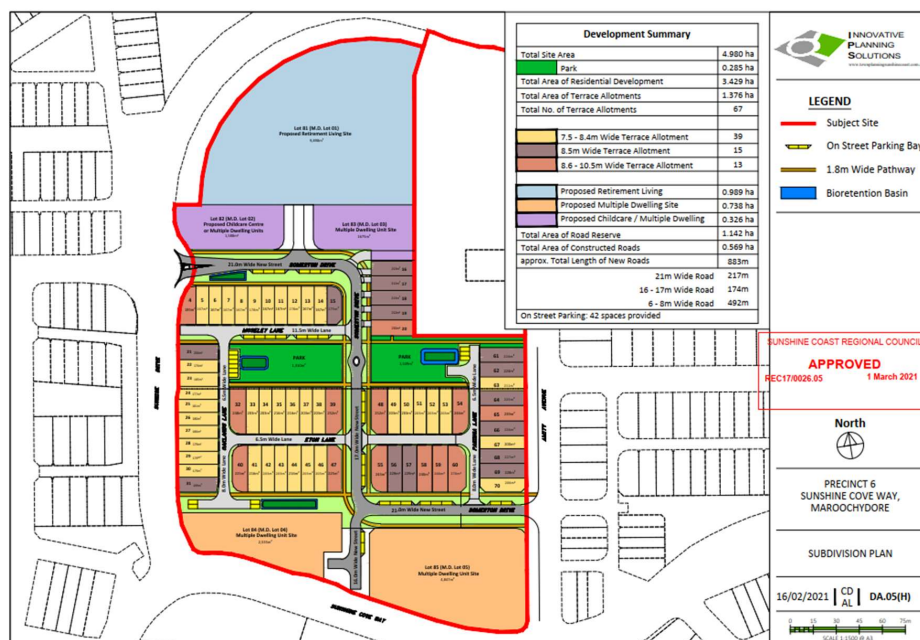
Lot Layout Plan approved under subdivision approval (REC17/0026)
